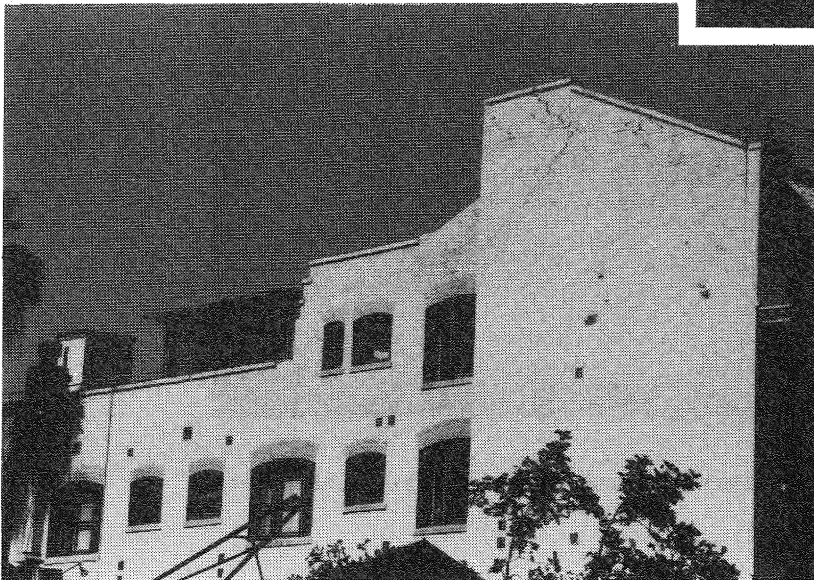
CRACKED WALLS IN FIGURE 7 BUILDING
